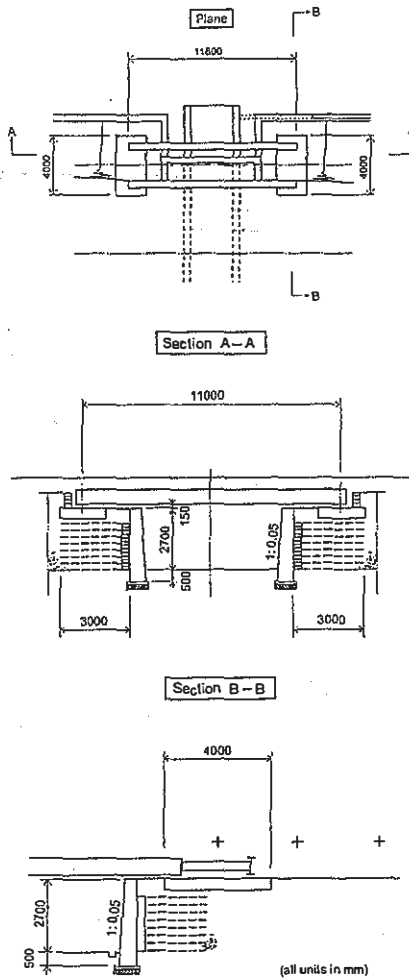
Plans and cross-sections of the bridge abutments at Takeshima BV
